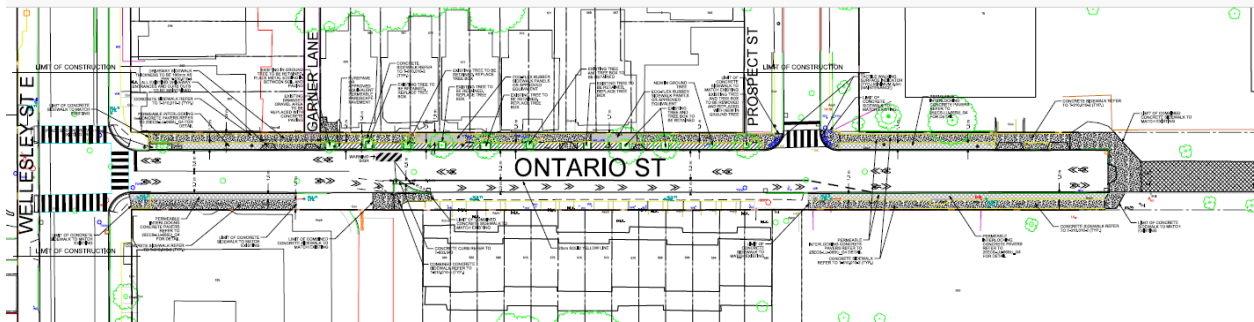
Illustration of the proposed design on Ontario Street between Wellesley Street East to Winchester Park trail.
